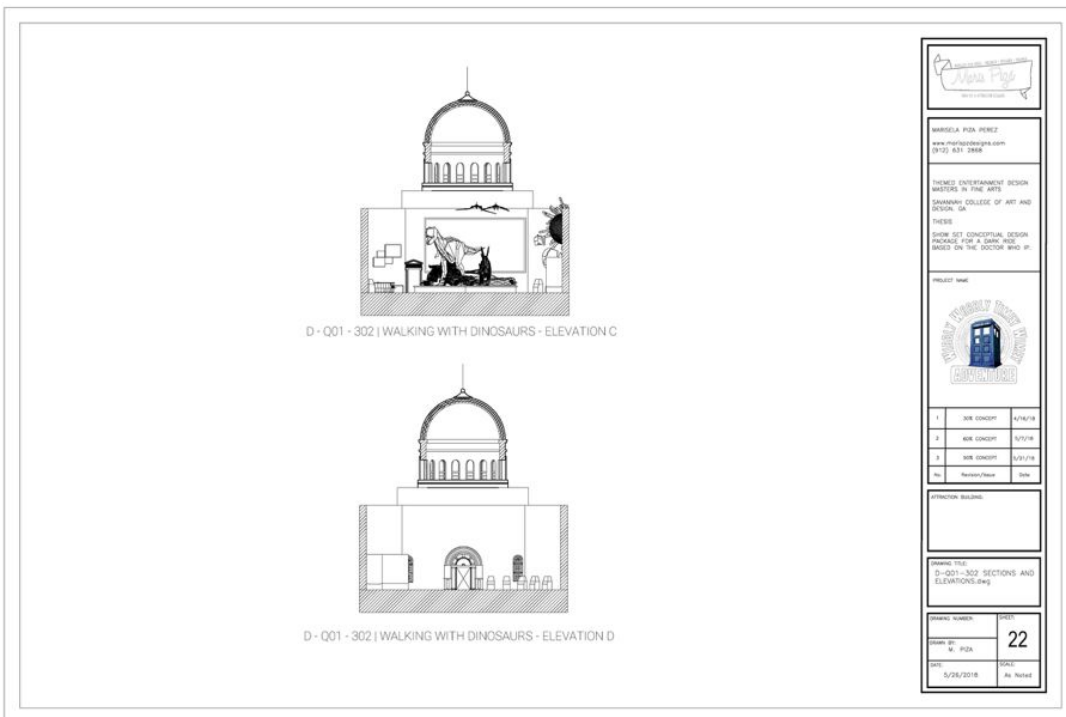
D-Q01-302 | Walking with Dinosaurs - Sections and Elevations
